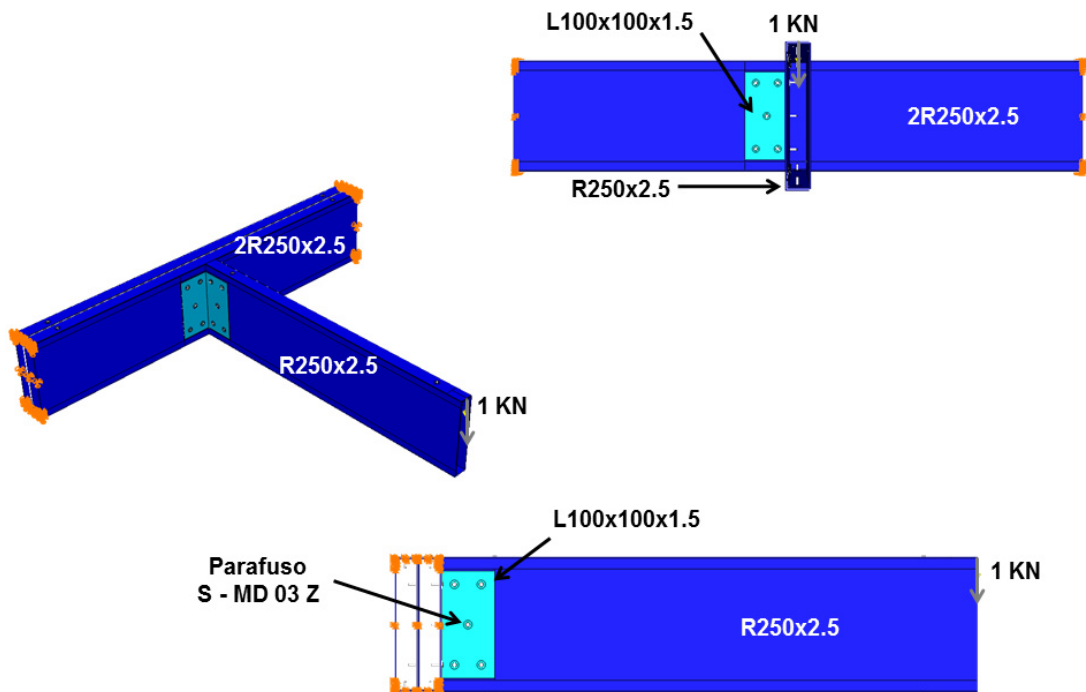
Views of a connection between an R beam and a 2R beam (connection C_2)
